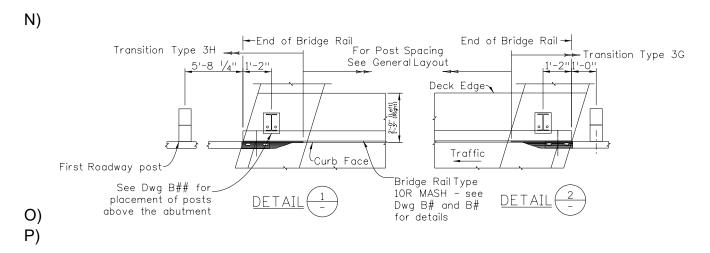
(A)-2 Sample Detail showing Bridgerail post locations/clearances near Abutment
